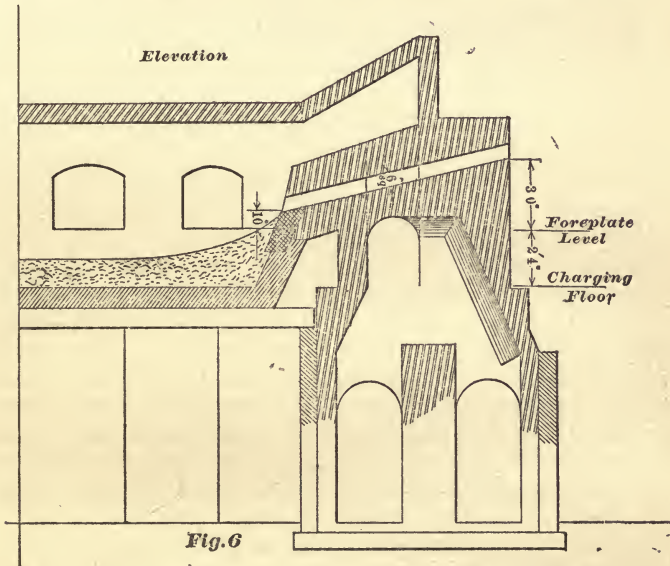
FURNACE ARRANGED FOR BURNING OIL
